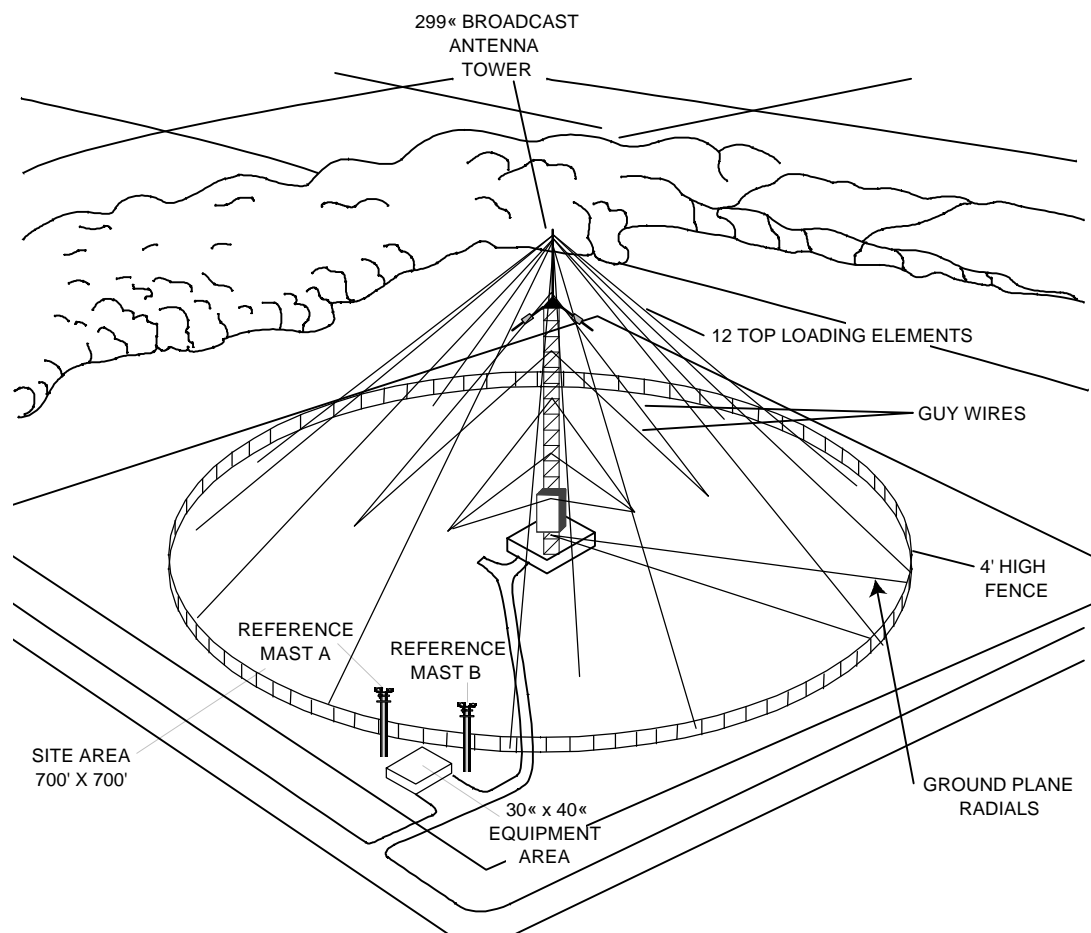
Typical existing GWEN radio transmitter site layout.
